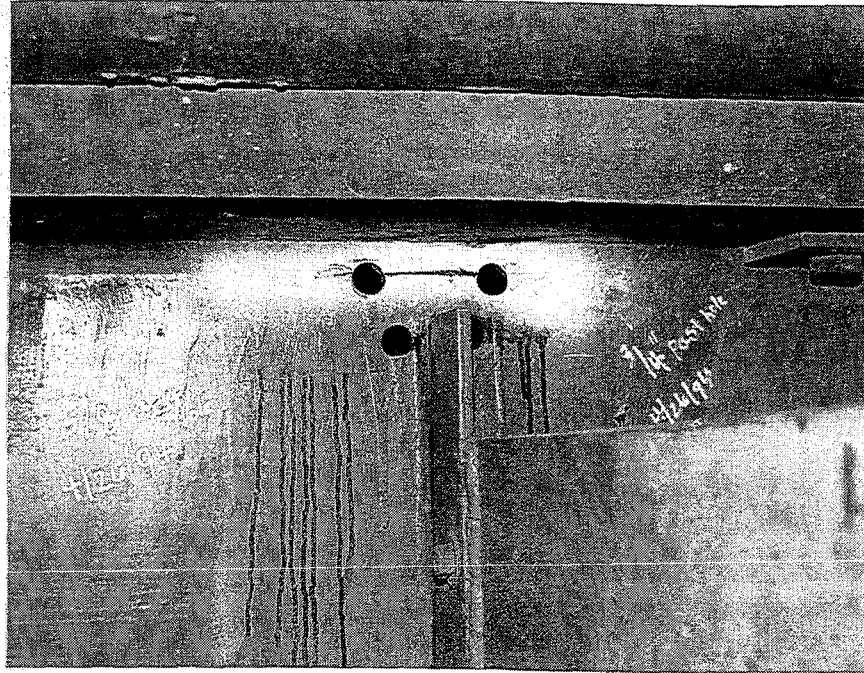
Web Cracks at Welded Plate Connection
